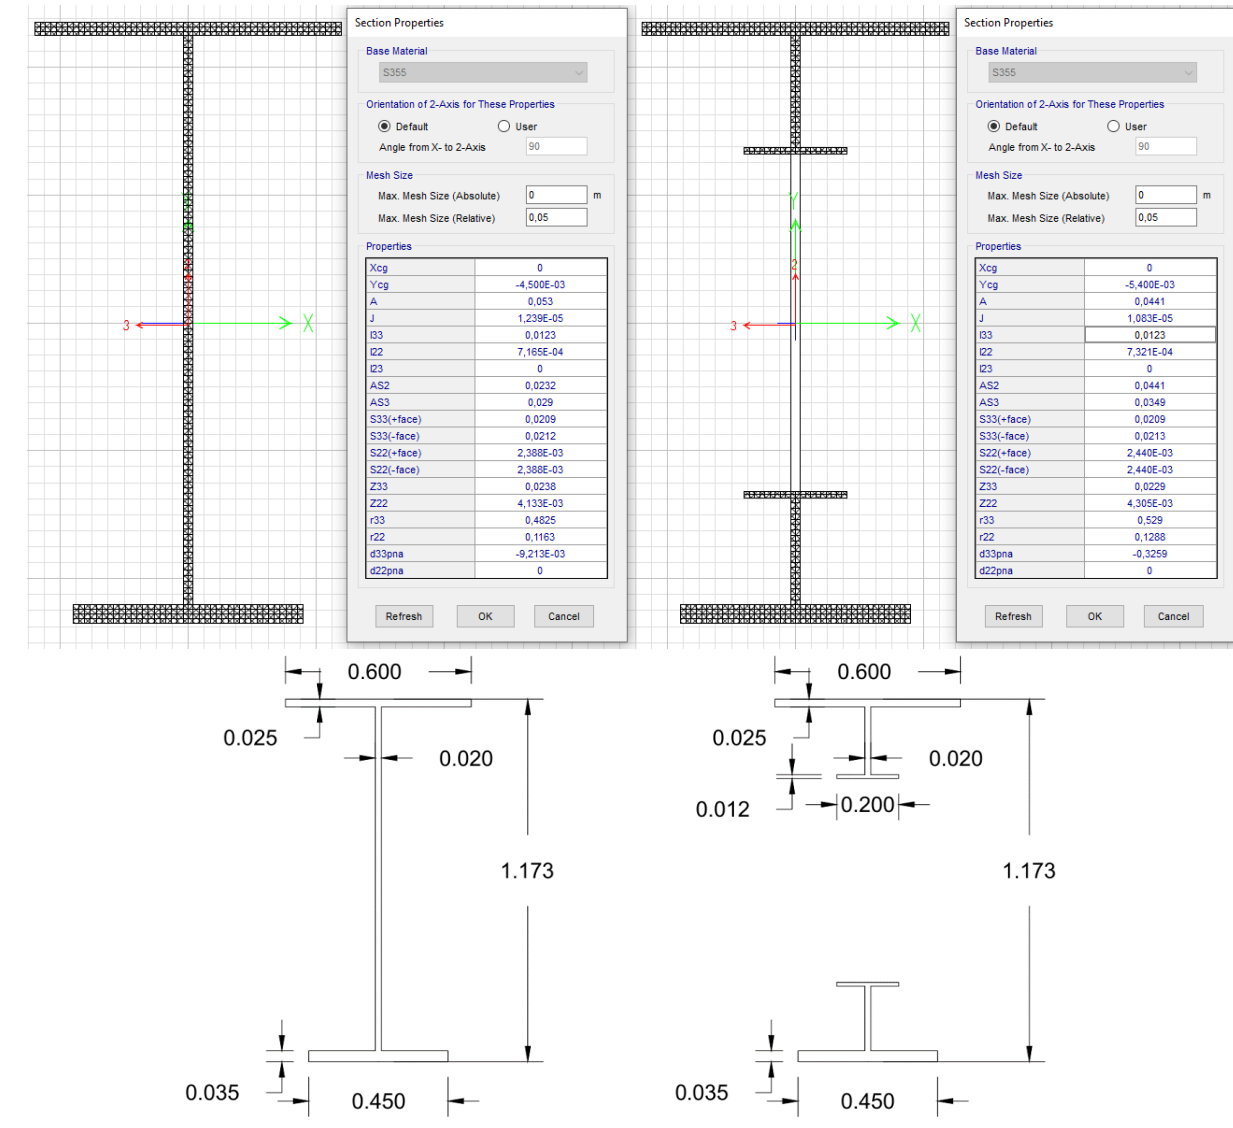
Cross section of the transversal beam in the center and the corresponding section properties [Own elaboration]
